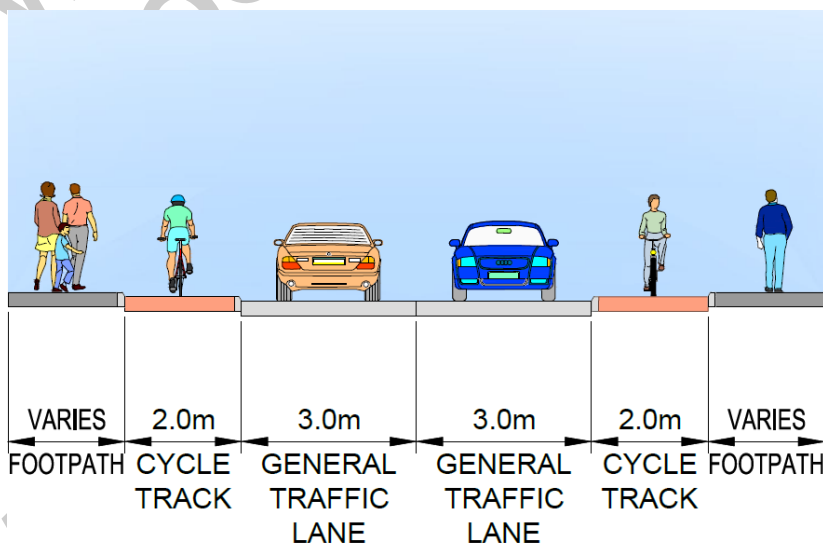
Section 1, Proposed Option 5 – Cross Section A-A
